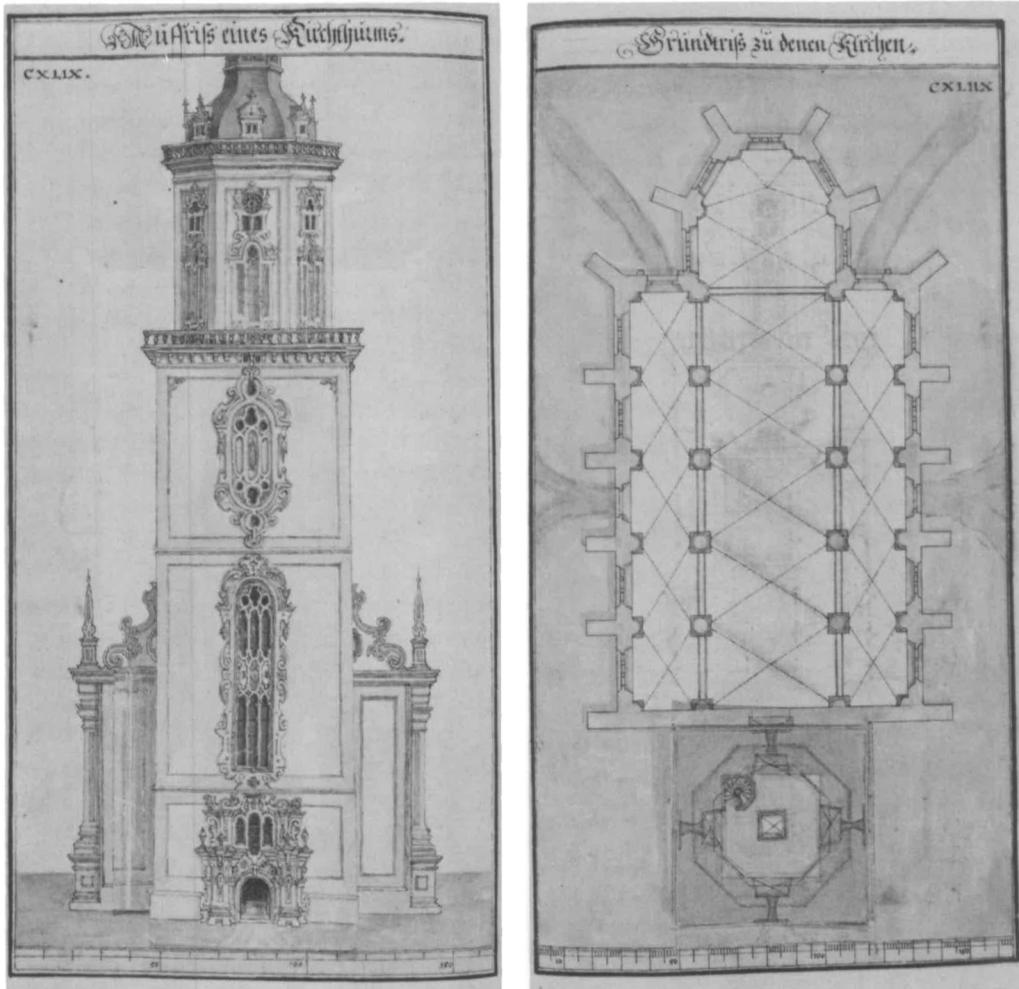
Plan and elevation of a church (Aufriss eines Kirchthurms; Grundriss zu denen Kirchen) Schwalbach, plates 148–49. (Canadian Centre for Architecture)
